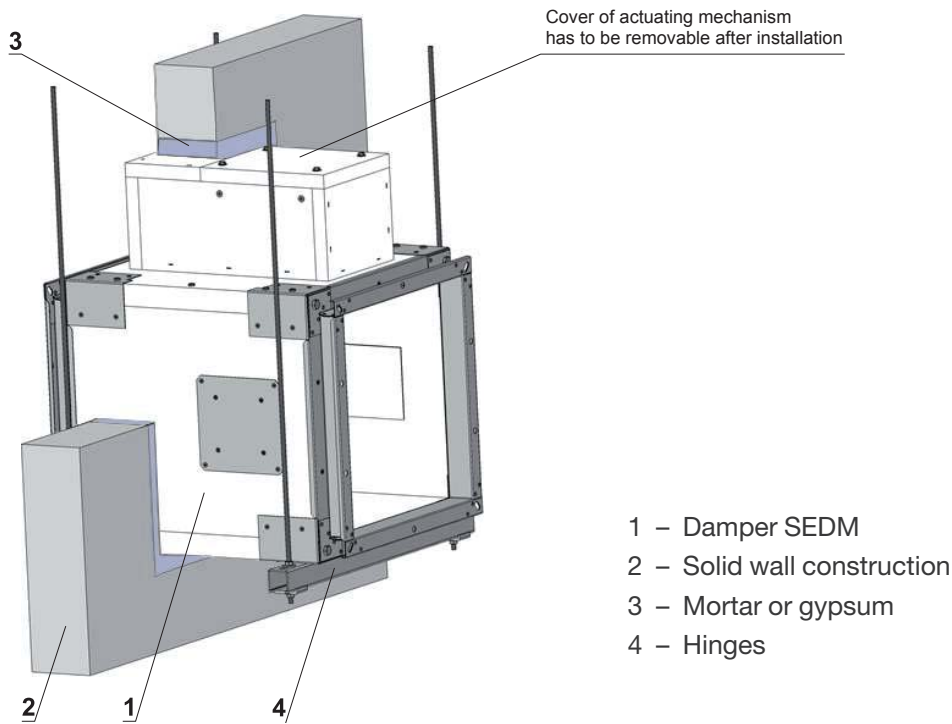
Example of installation in solid wall construction of fire compartment - horizontal blade axis position
